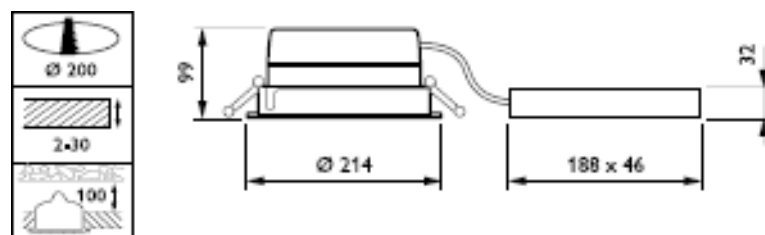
Dimension Drawing of Luxspace 2 Compact LED12S/830
